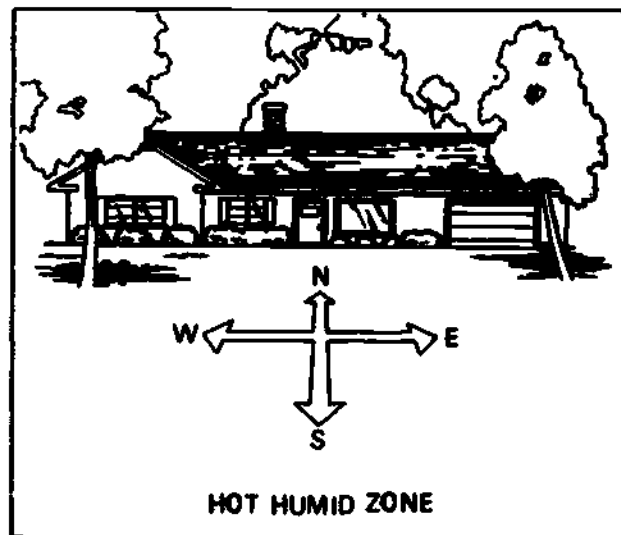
Buildings in the hot-humid zone should be oriented toward the north or south with ample shade for summer.
